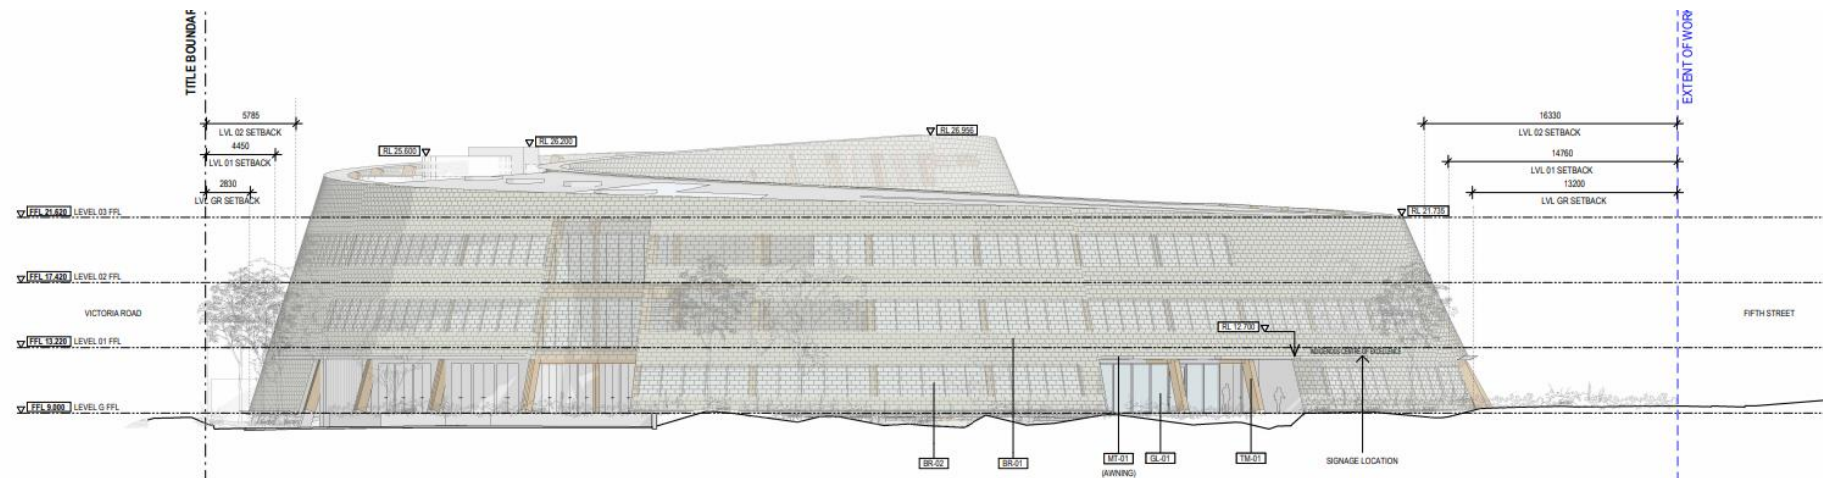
West Elevations. Source: Jakson Clements Burrows Architects 2024
